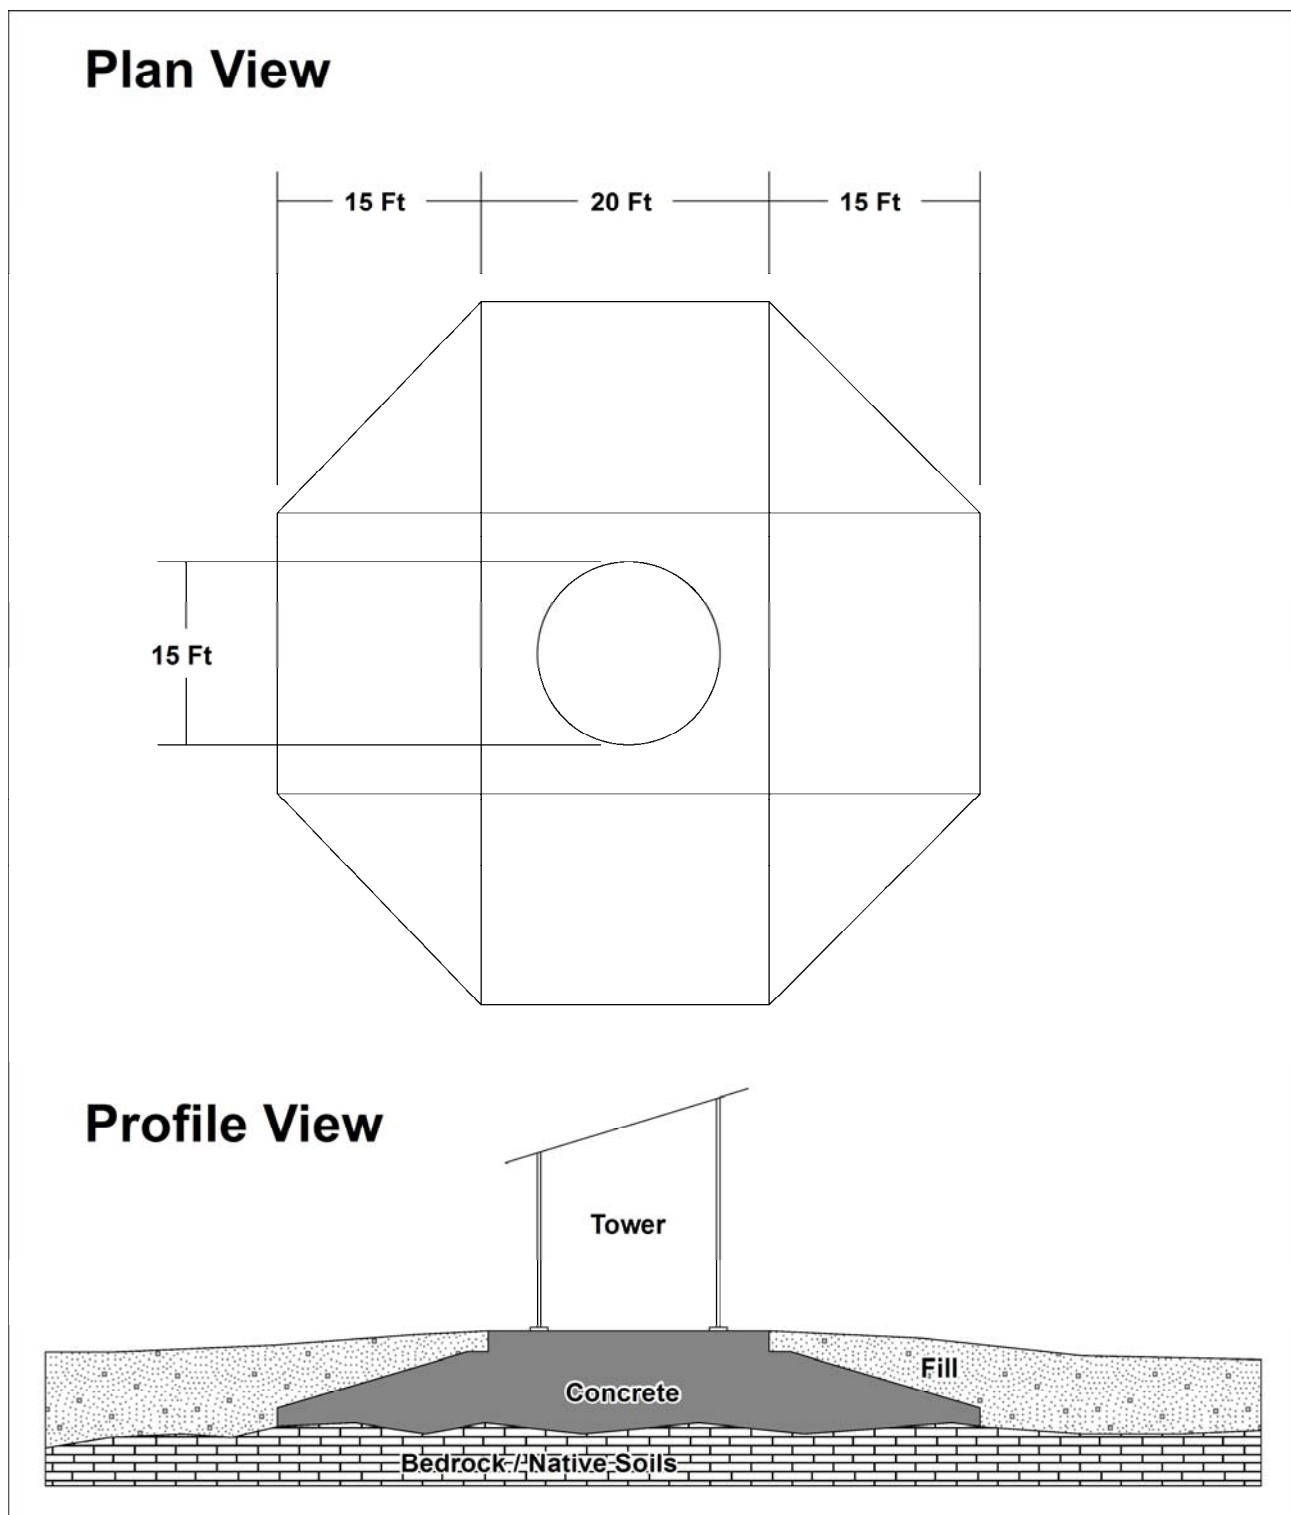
Diagram of a typical spread footer foundation for turbine towers
